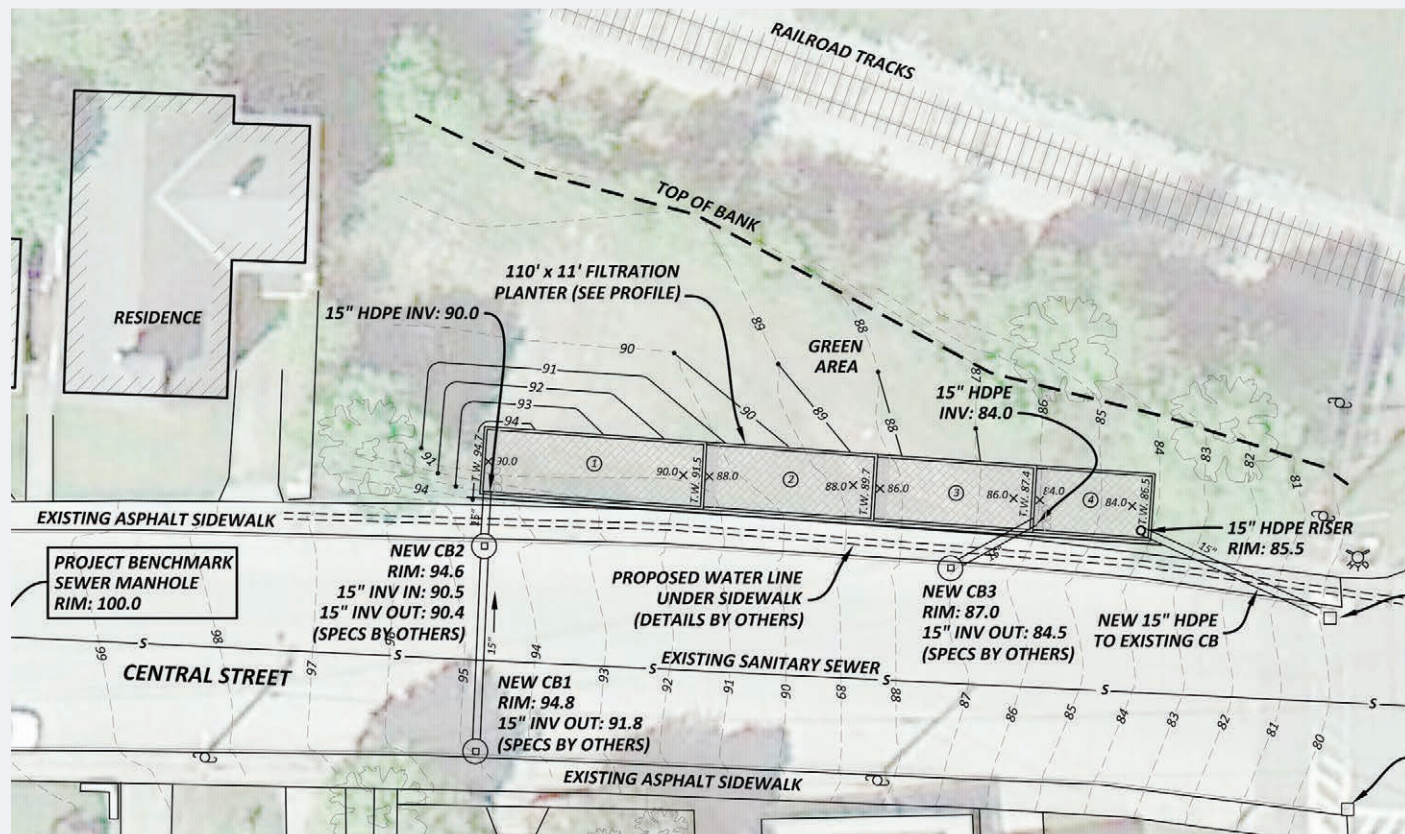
CS-5-2. Plan view of west filtration planter plan detail.
